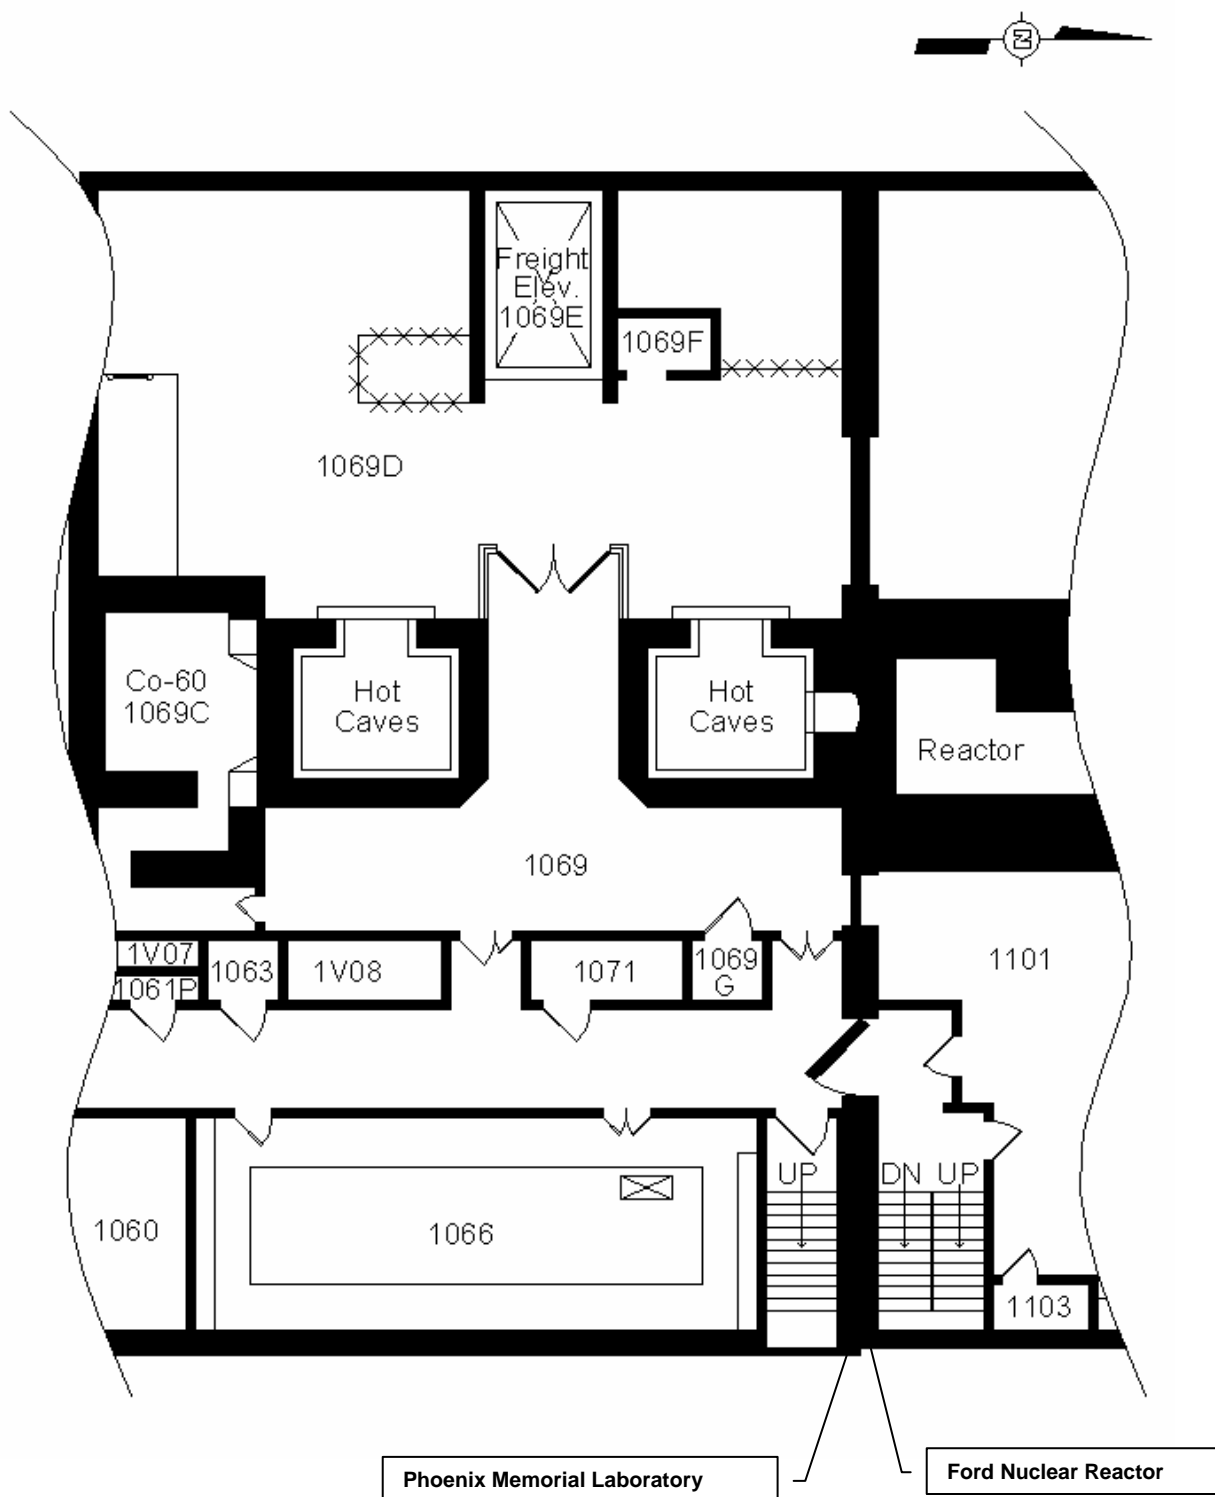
, PHOENIX MEMORIAL LABORATORY 2<sup>ND</sup> FLOOR - SECTION
